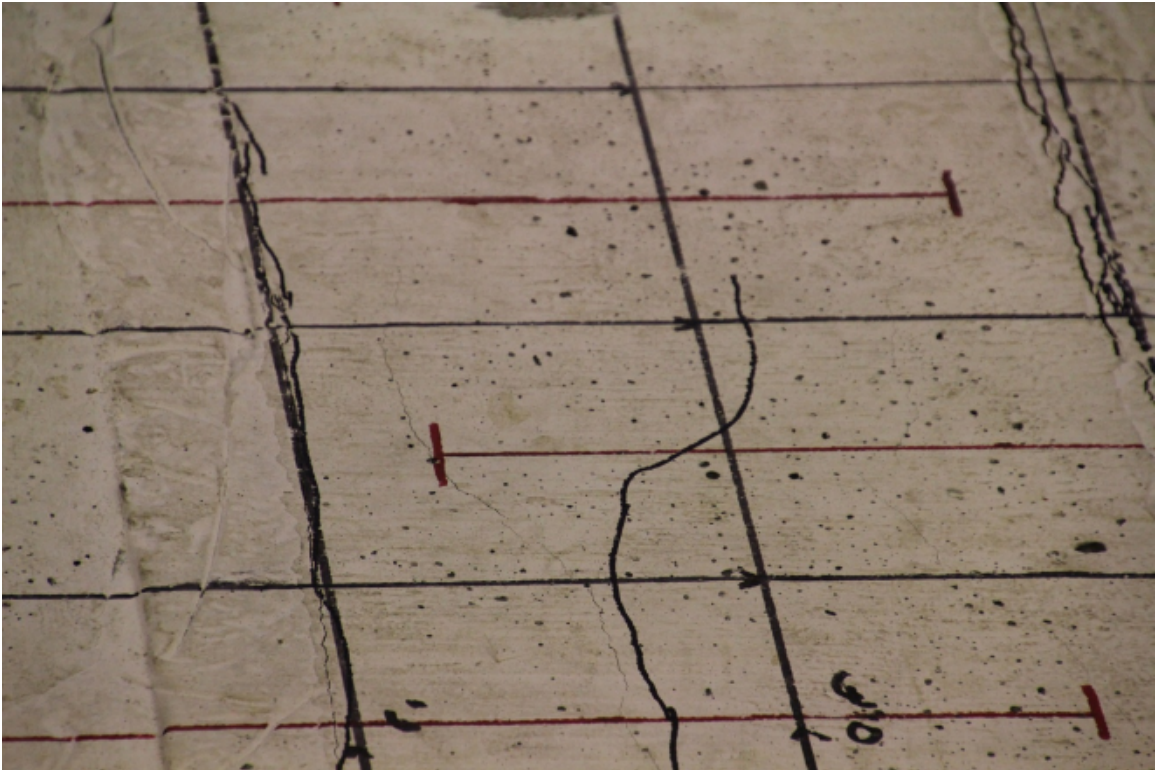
FINAL PREPARATION OF SLAB SPECIMENS
